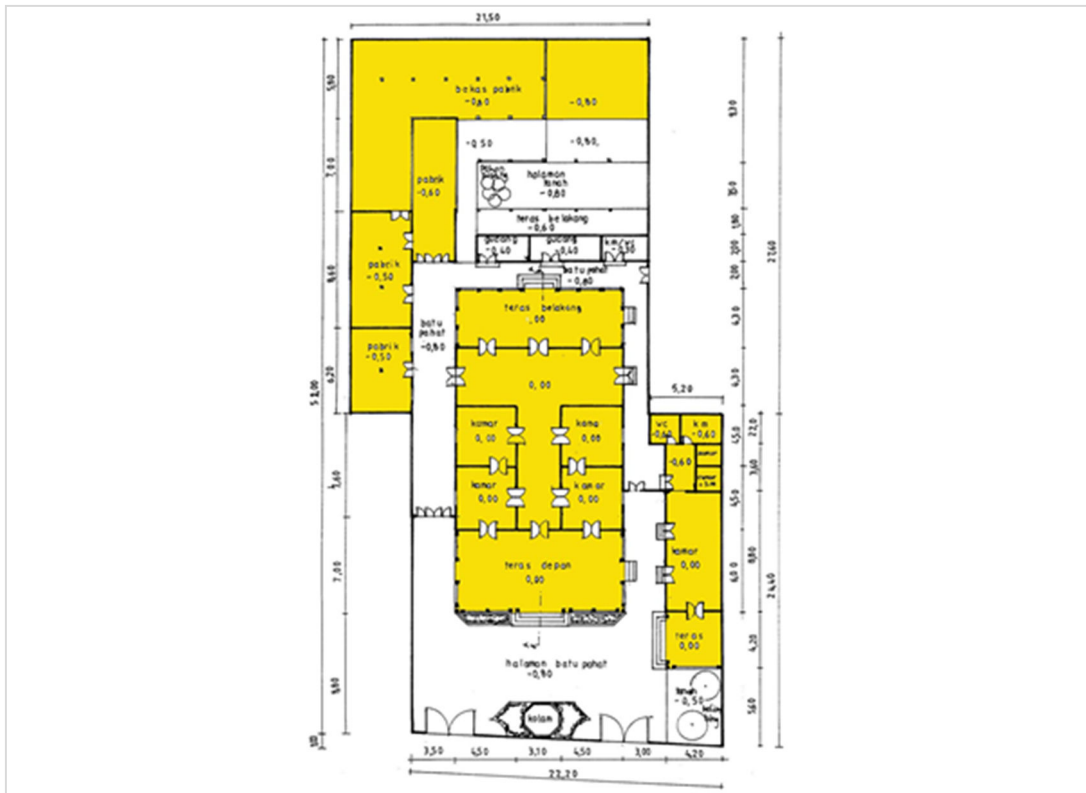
Floor plan of a batik merchant's house with a modern room pattern (not a Javanese room pattern)
